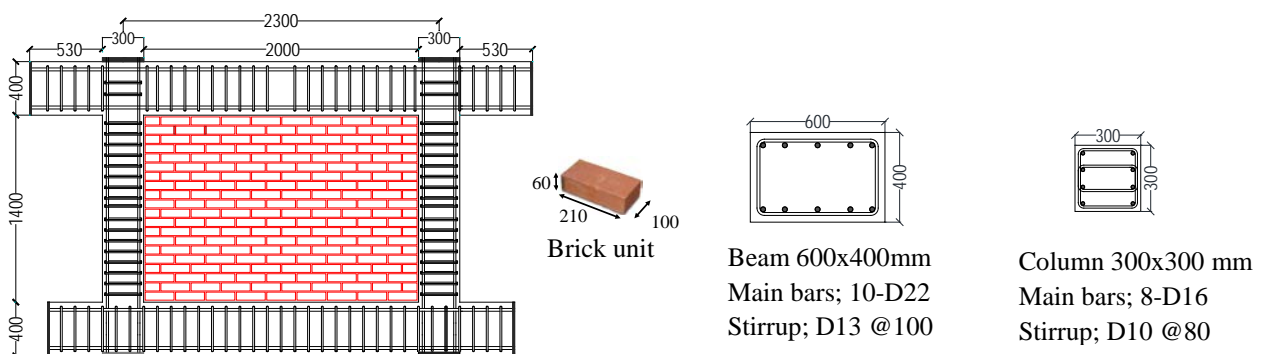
Dimensions and reinforcement of specimen BR; units in mm
